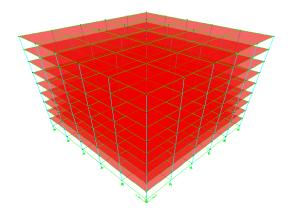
Model 3: 3D Model of RC frame of G+8 storey building
